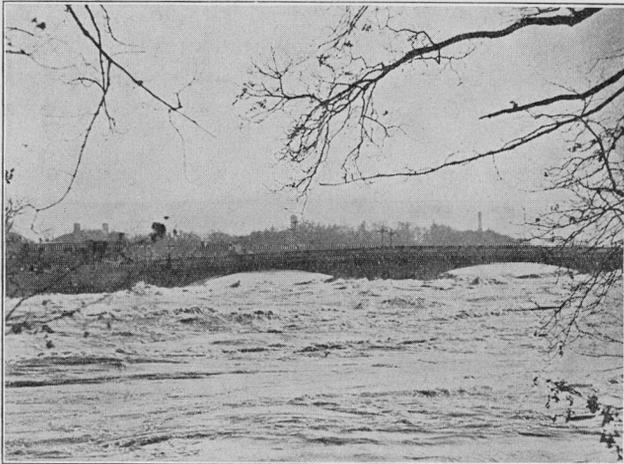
MERRIMACK RIVER AT LOWELL THE DAY AFTER THE PEAK, THE WATER SURFACE AT PAWTUCKET DAM BEING AT ABOUT ELEVATION 100. PAWTUCKET BRIDGE STILL AN OBSTRUCTION
